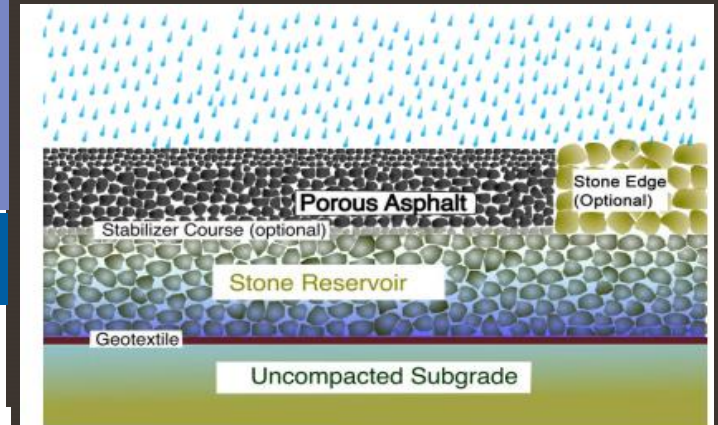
Typical porous asphalt pavement with stone reservoir cross section
